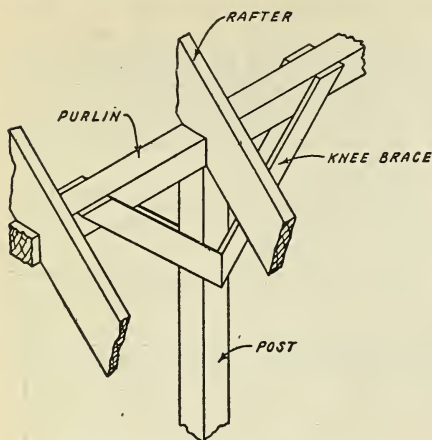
Knee bracing of a purlin supporting roof rafters
